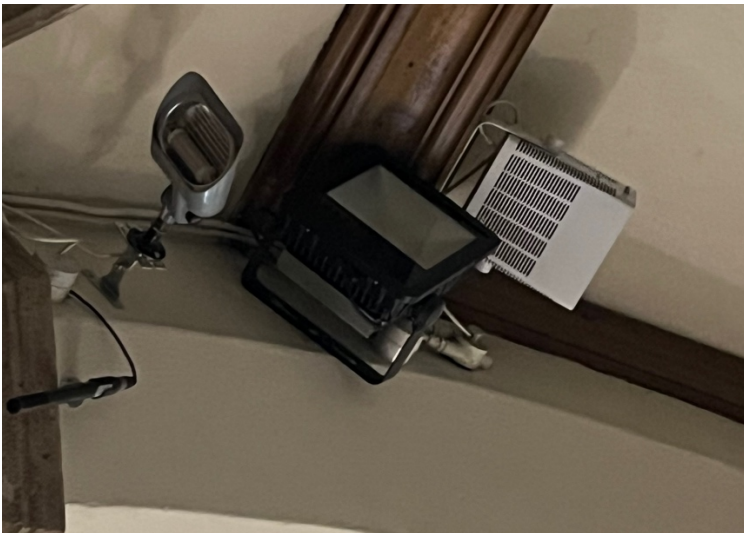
Assorted Lights on the Chancel Ceiling and Wall (North)
